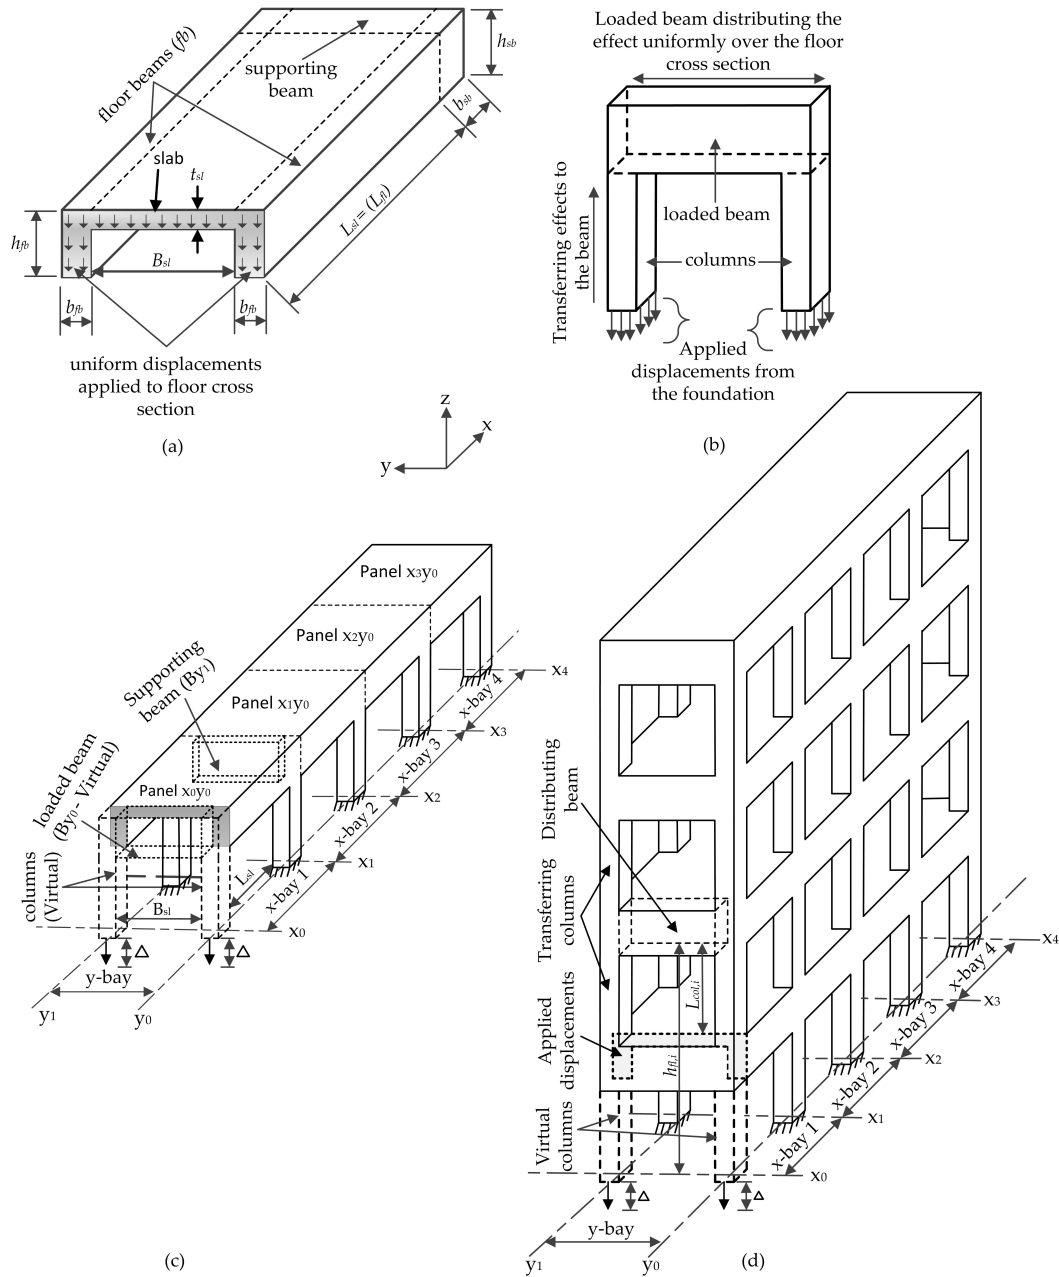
(a) Typical floor subjected to displacements, (b) conveying displacement effects through columns to beams, (c) typical numerical model of a single storey, single y-bay building, (d) single y-bay, multi x-bay and multi storey building
